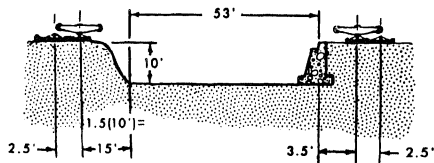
Profile of bridge site—one prepared abutment and one bank without prepared abutment.
